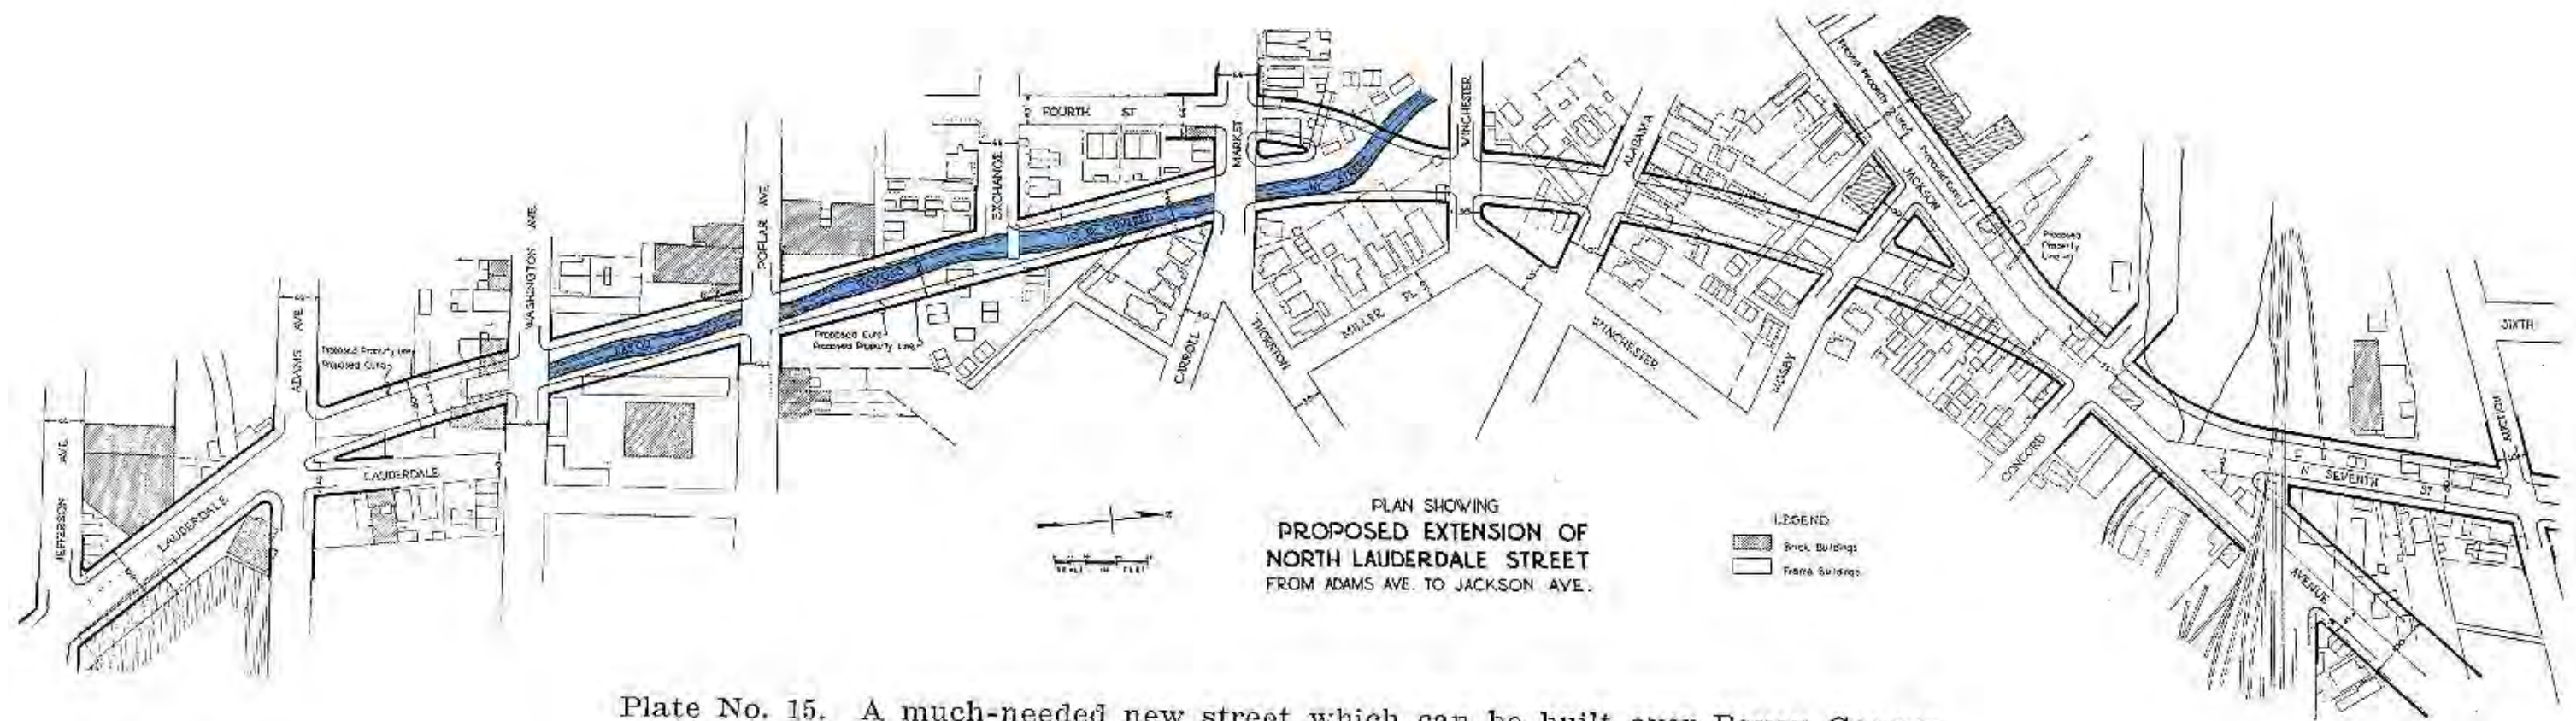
A much-needed new street which can be built over Bayou Gayoso.
